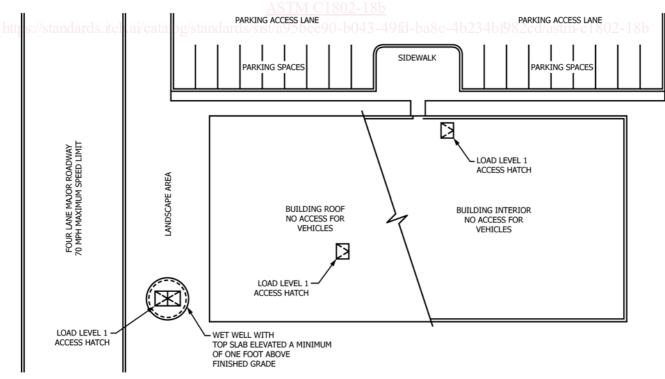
Plan Showing Appropriate Locations for Load Level 1 Access Hatches-Light Pedestrian Load
